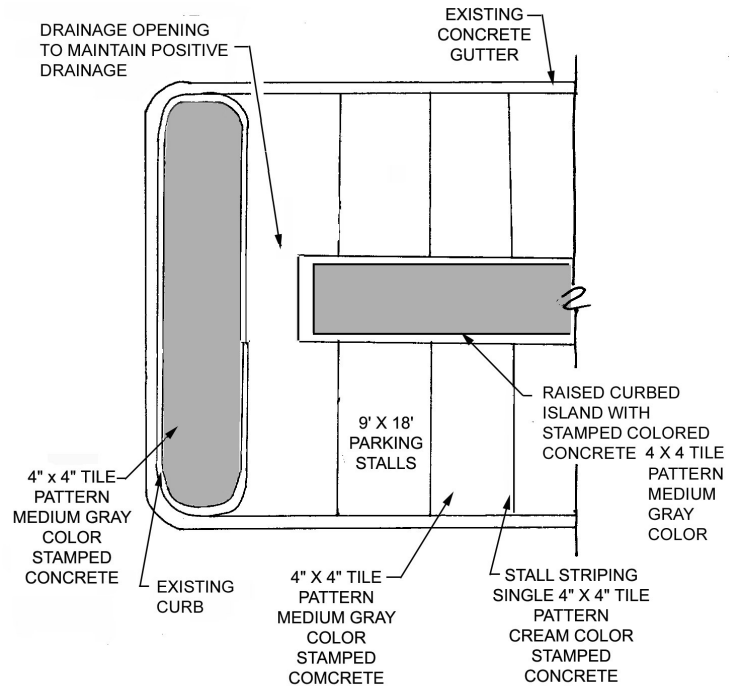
Alternative Parking Island Design for Daystar and Nightmist Court, Plan View
